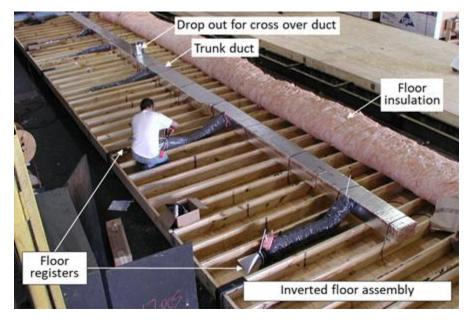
Duct system being installed on an inverted floor section that will be flipped over once completed
